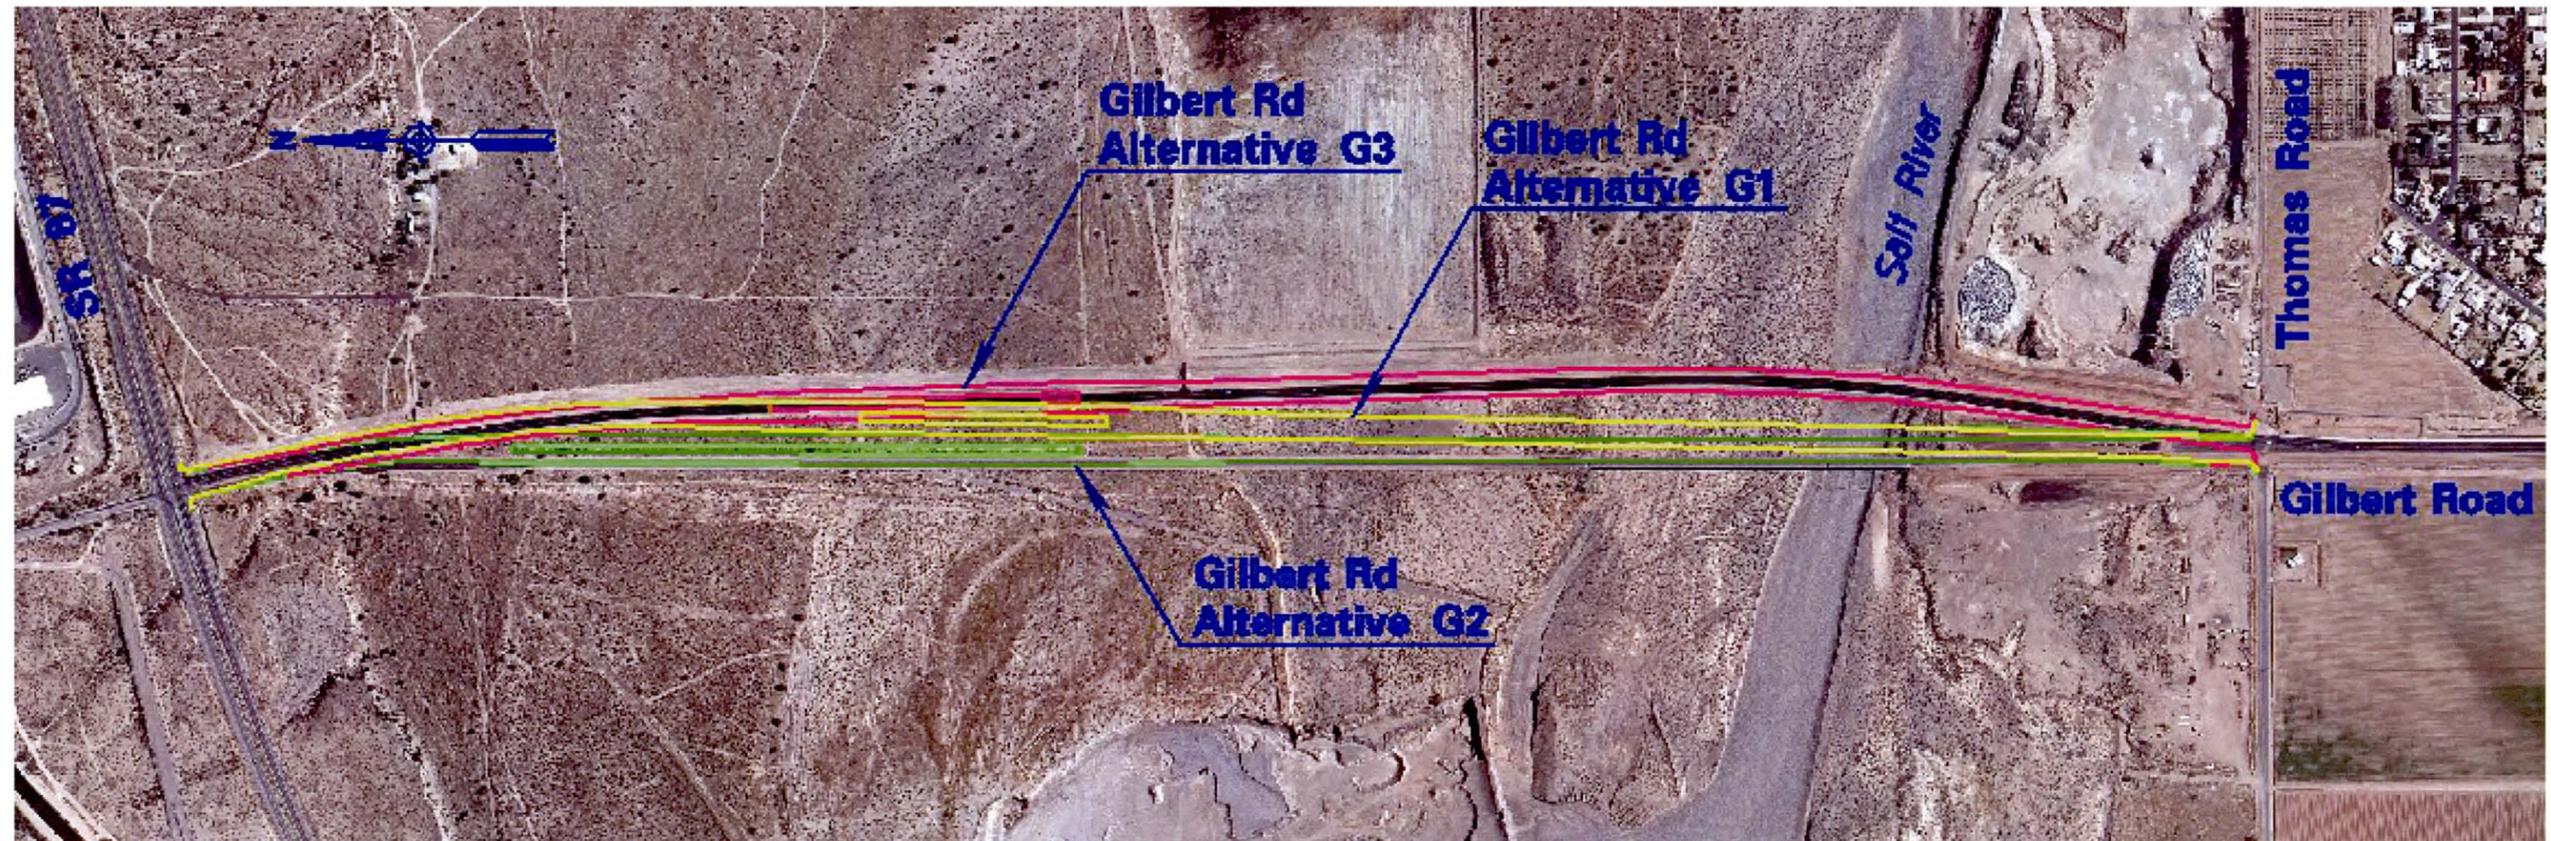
Gilbert Road Bridge Alignment Alternatives
